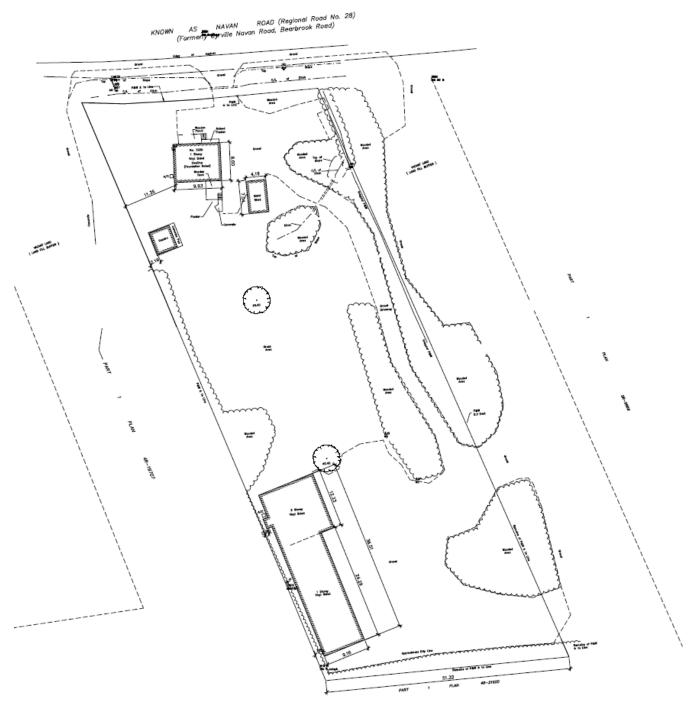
Site Plan showing the new building and existing detached dwelling and accessory structures
